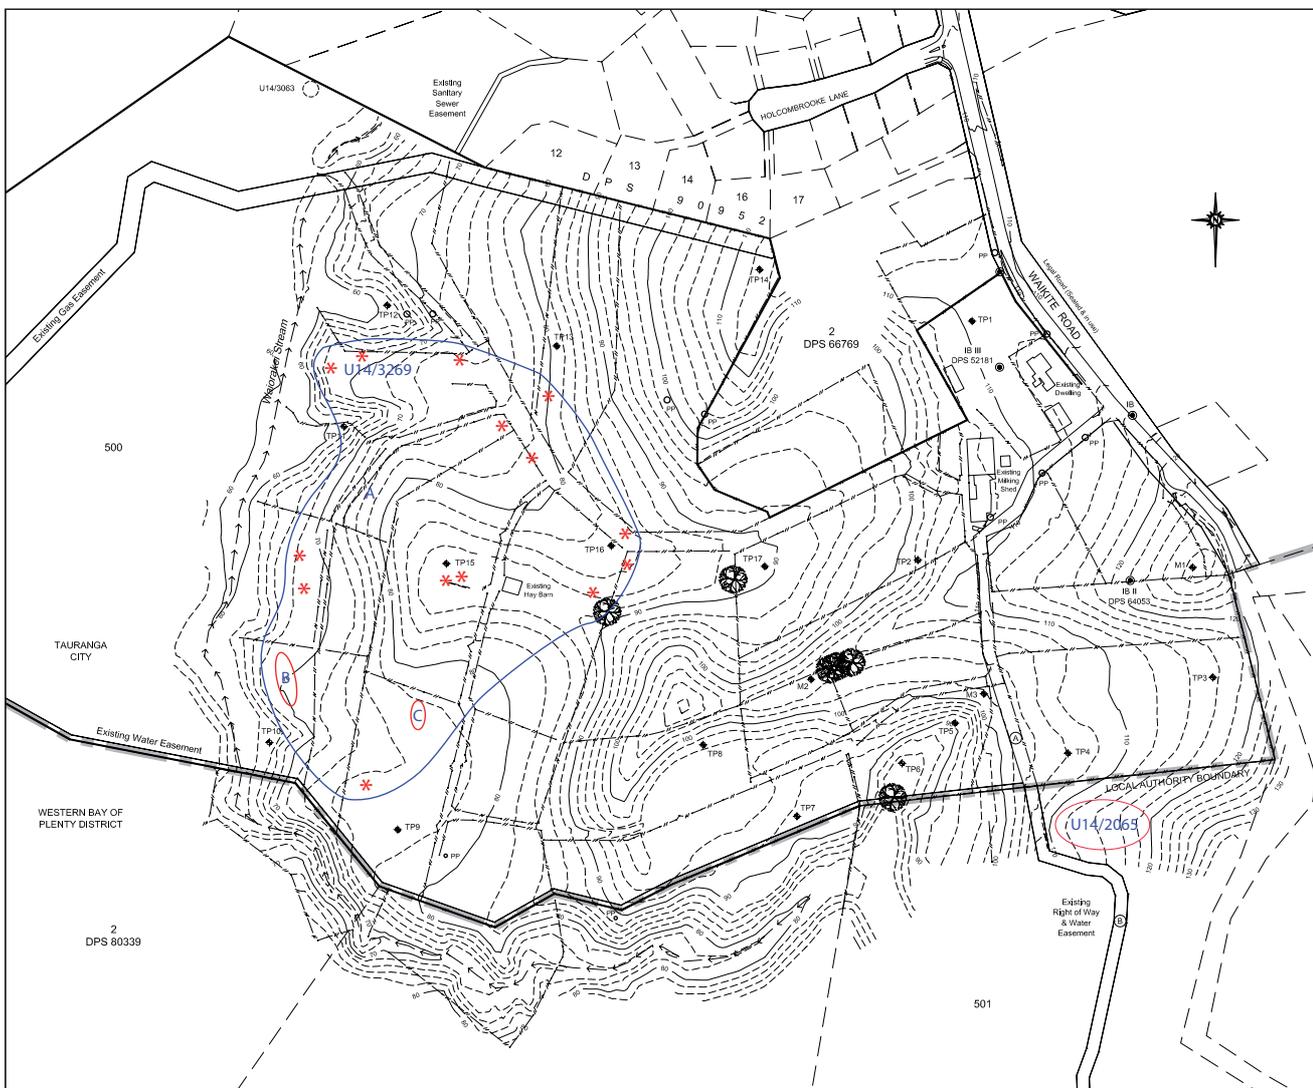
Site plan of Lot 1 DPS 64053 and Pt Lot 1 DPS 75053, showing the location of U14/2065 and U14/3269. Asterisks denote the location of isolated features recorded as part of U14/3269 by handheld GPS (accuracy ± 5 m).
